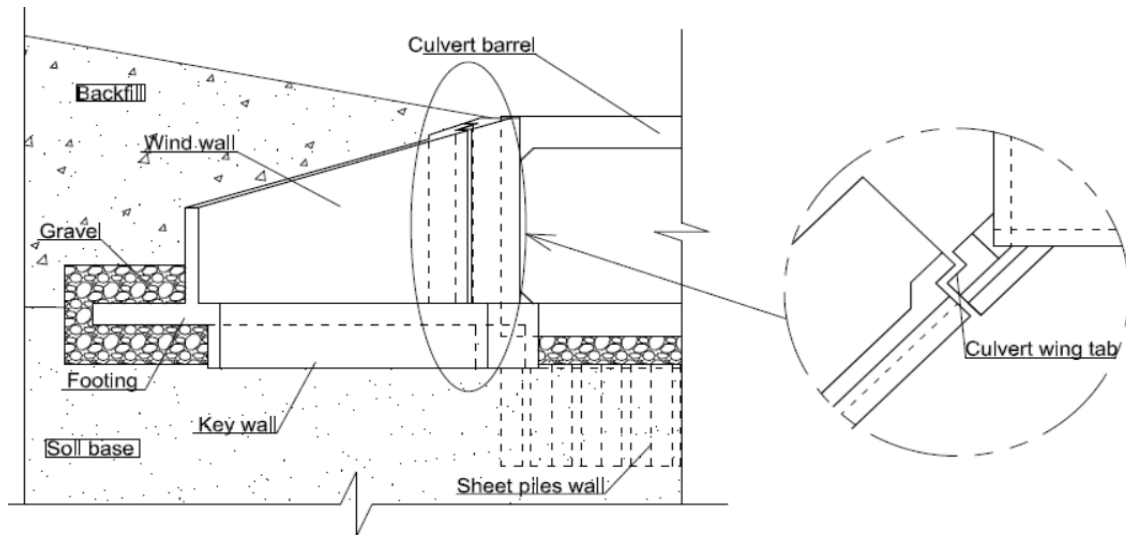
Front and plan view of the wing wall-to-culvert joint
